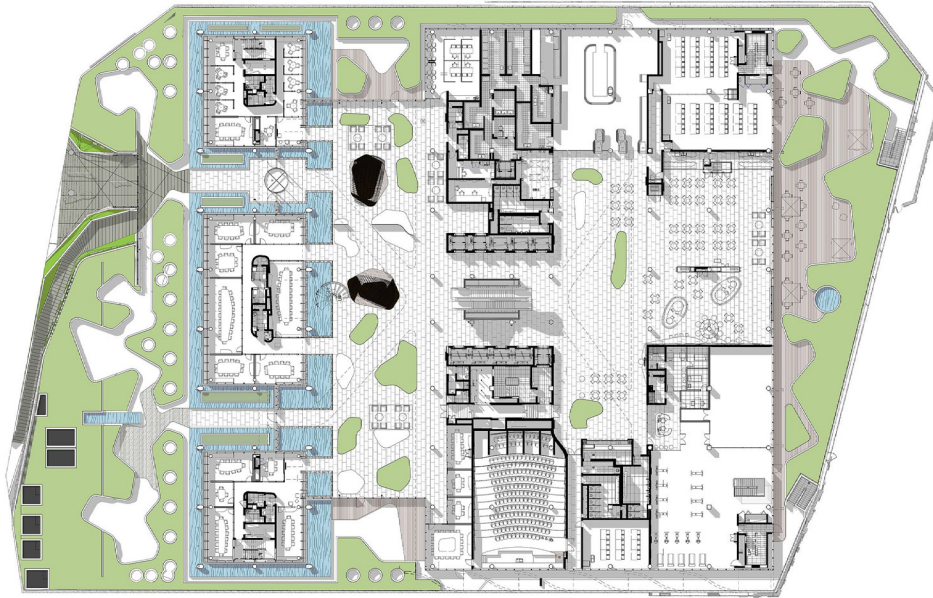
Ground floor plan (Arch Daily, 2012)
